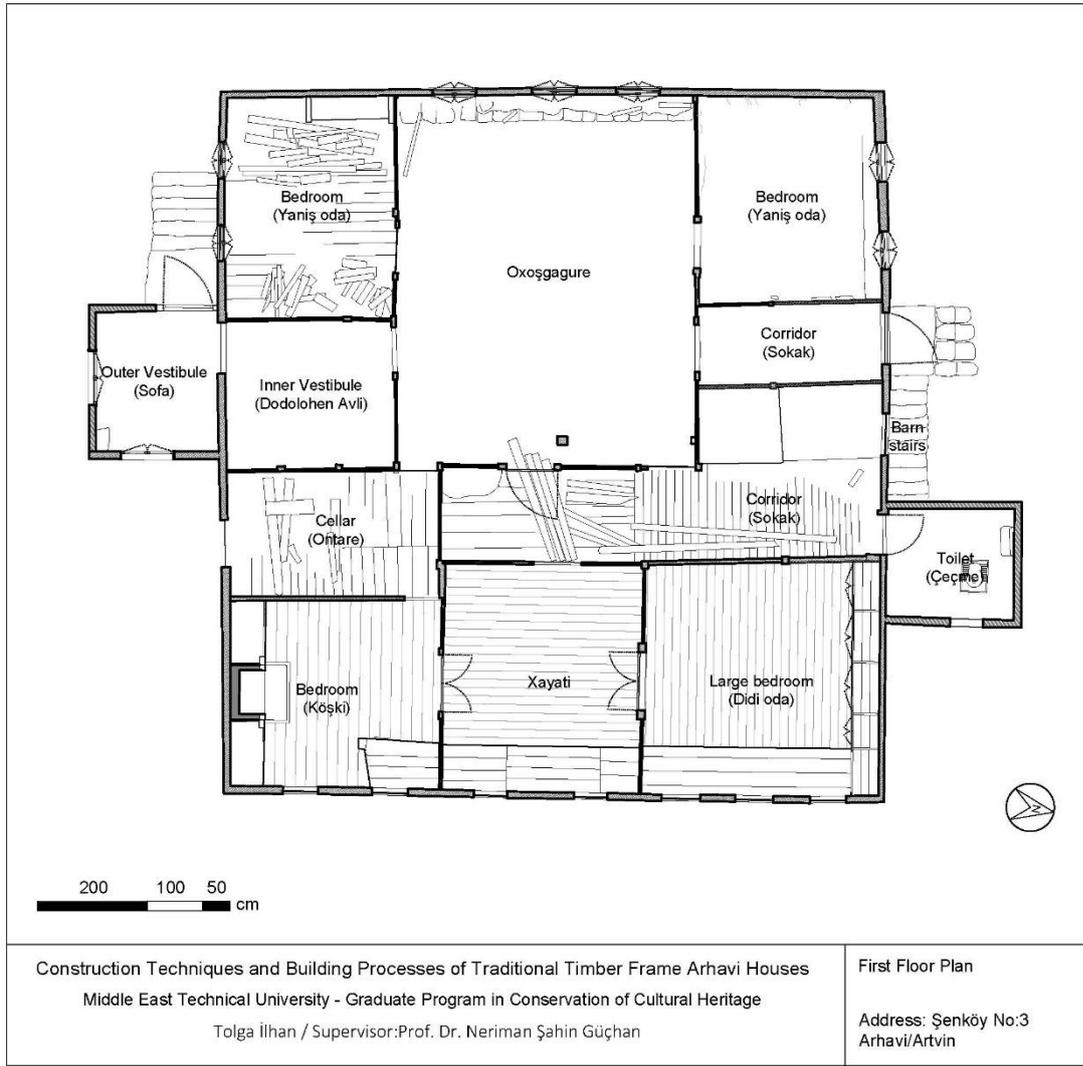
First floor plan scheme of Şenköy 3/Bilgin House
